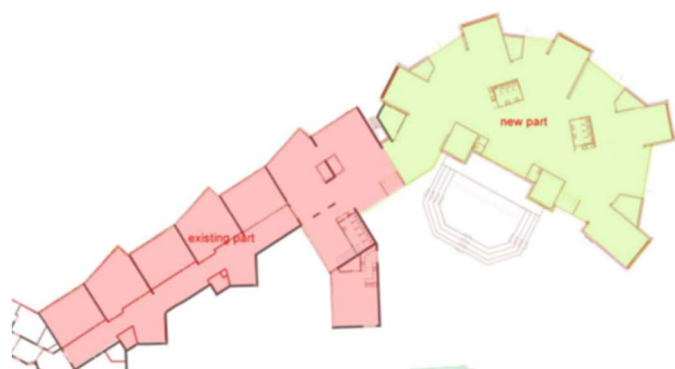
Overall school layout existing building & new extension. The new extension is marked in green above and has a more open-plan lay-out than the traditional existing building in pink.
